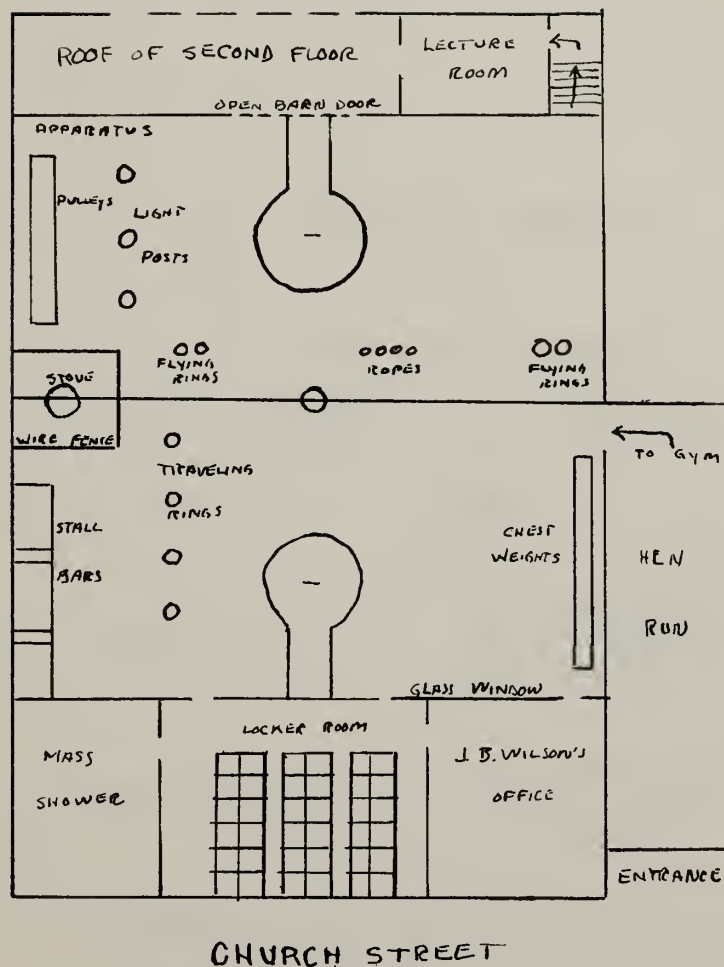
FLOOR PLAN OF THE SANATORY GYMNASIUM
